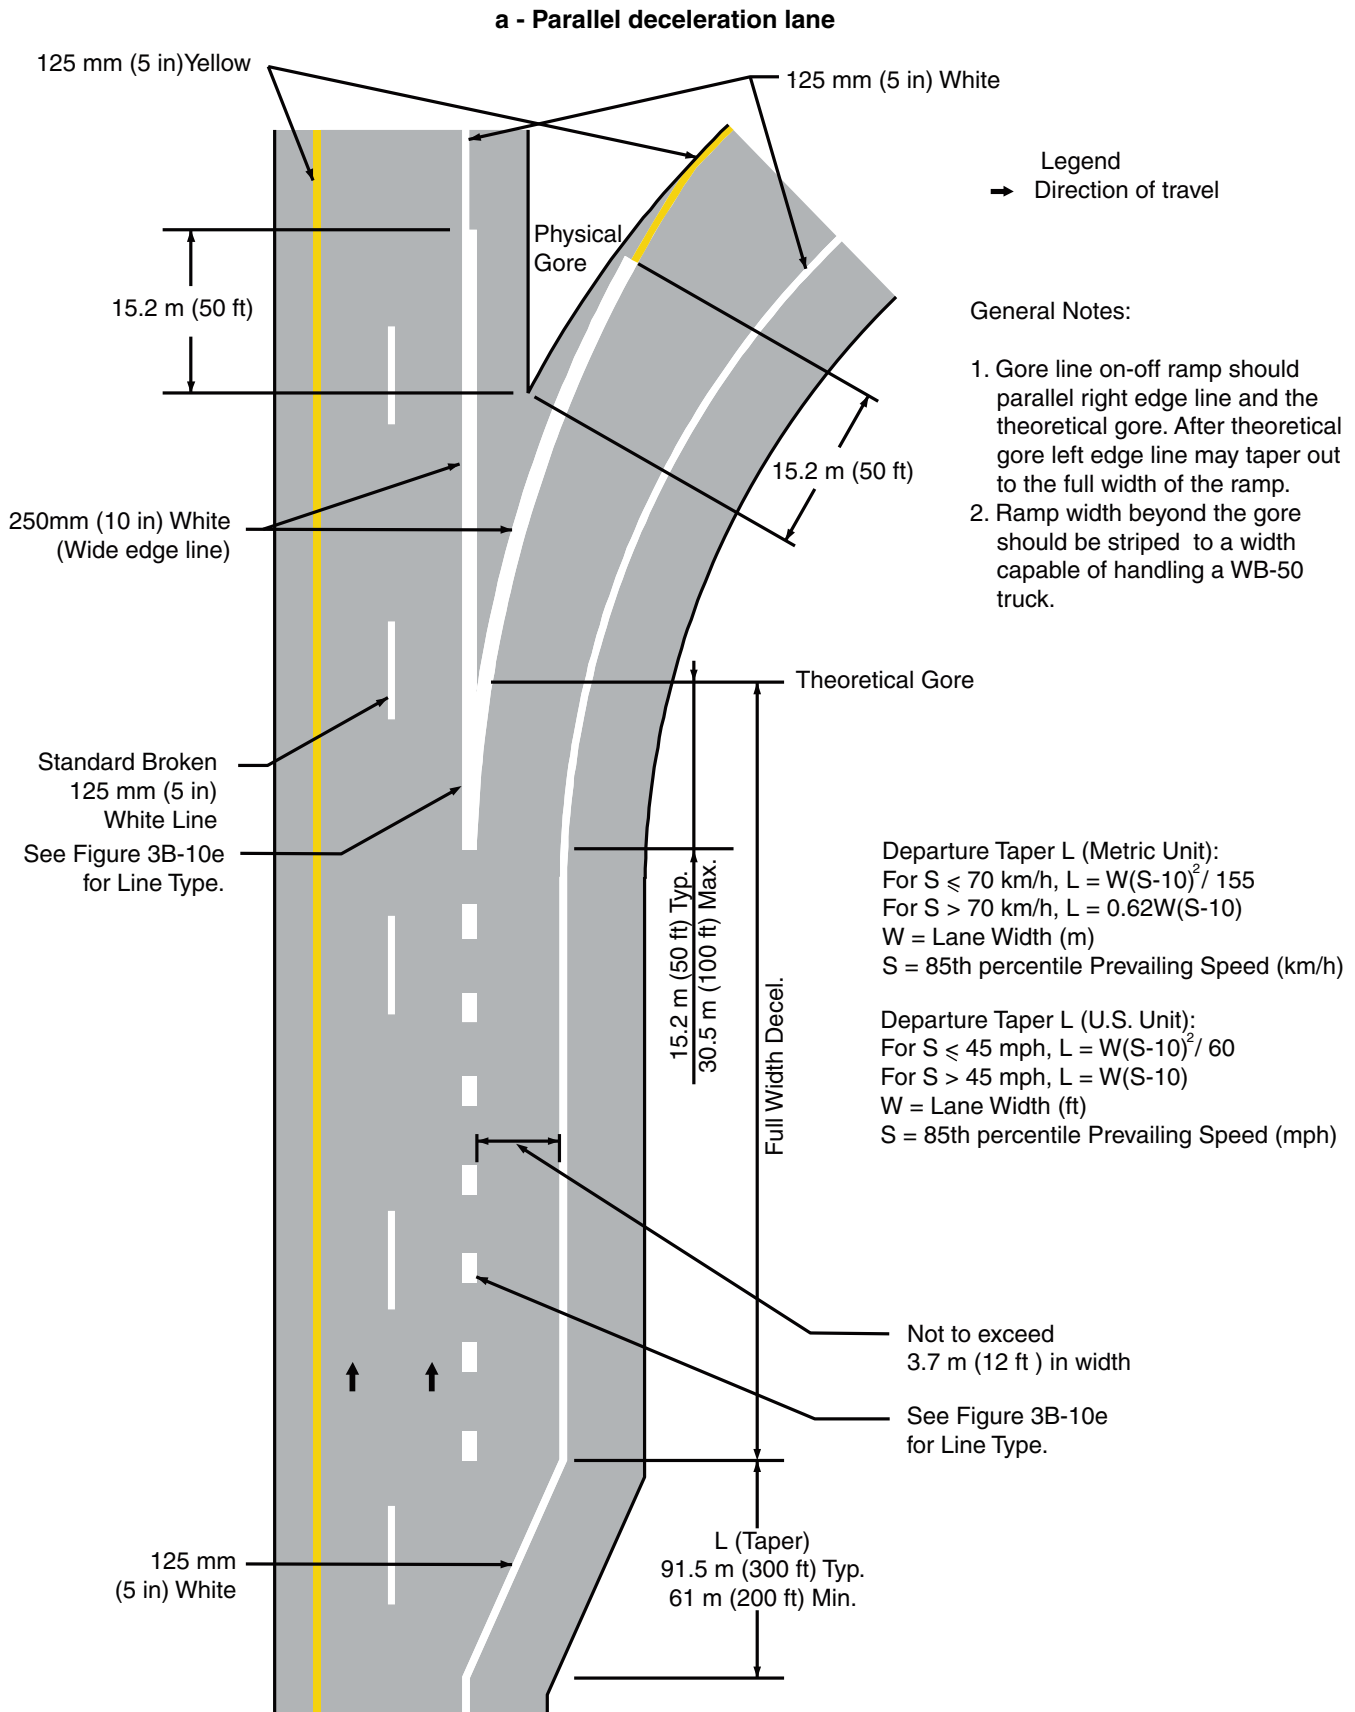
B-8. Examples of Channelizing Line Applications or Exit Ramp Markings (Sheet 2 of 4)
